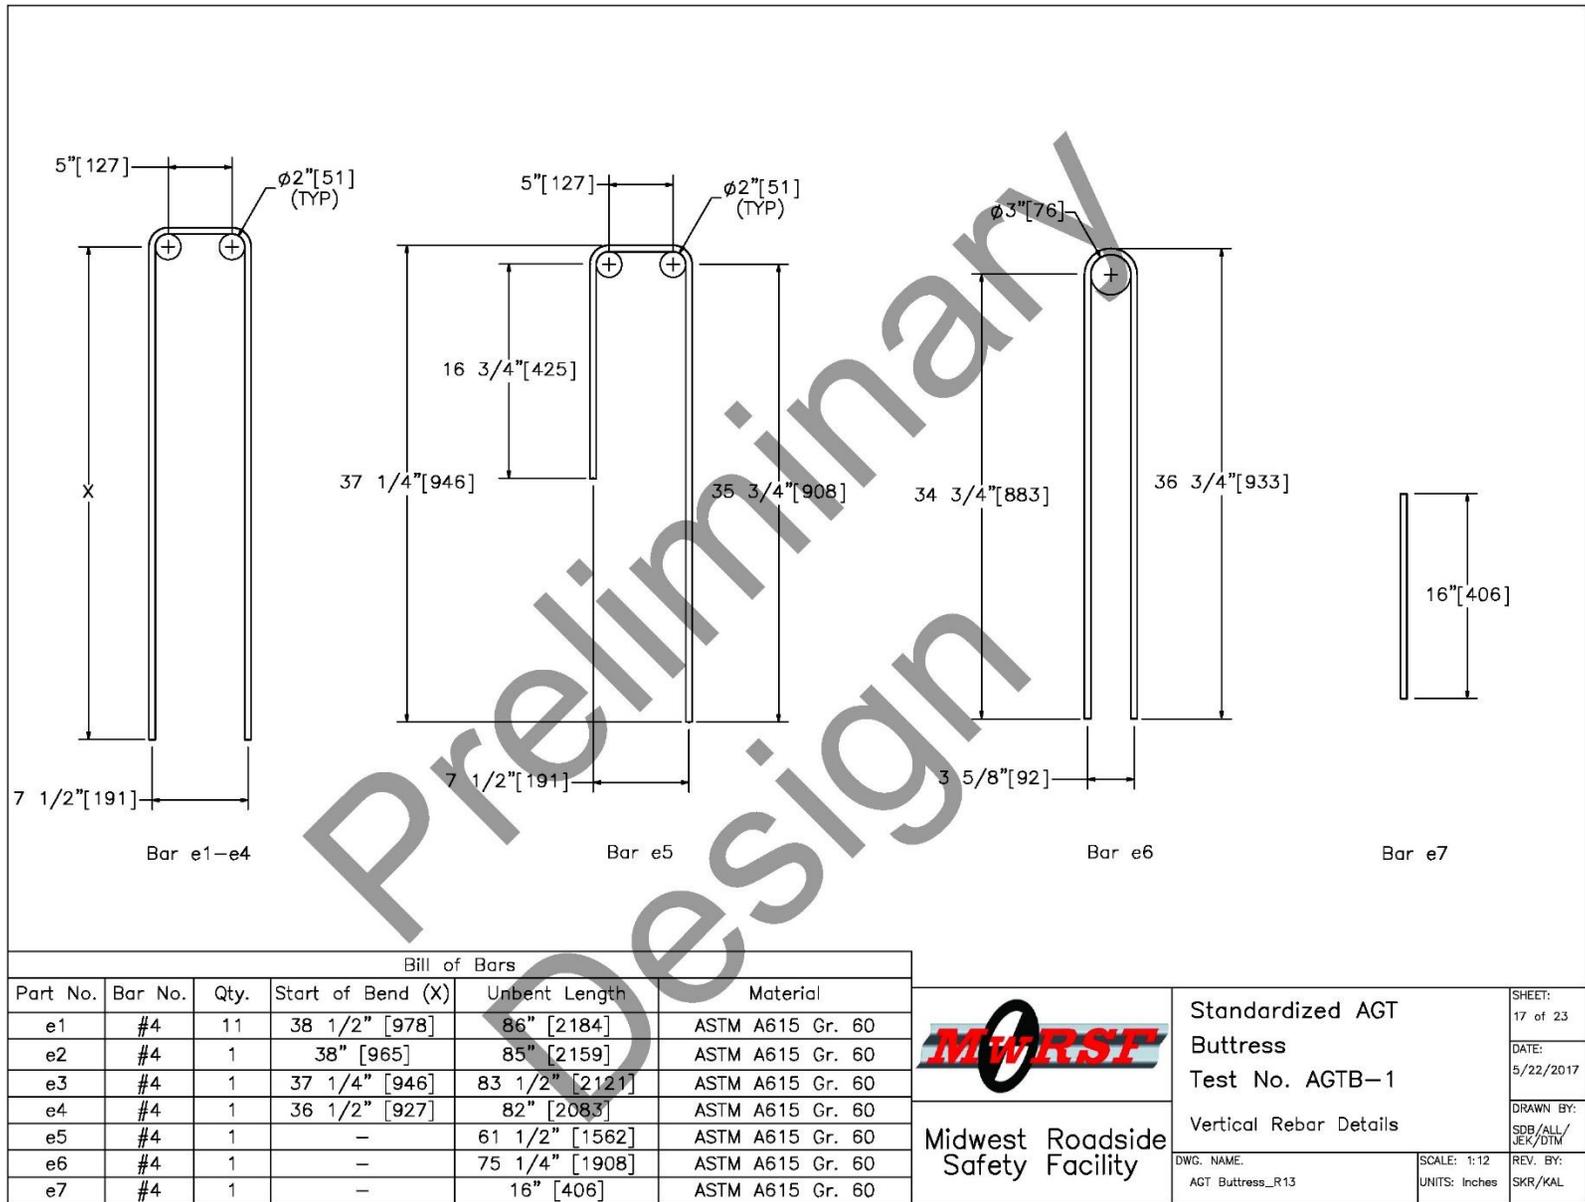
Buttress Vertical Rebar Details and Bill of Bars, Test No. AGTB-1
